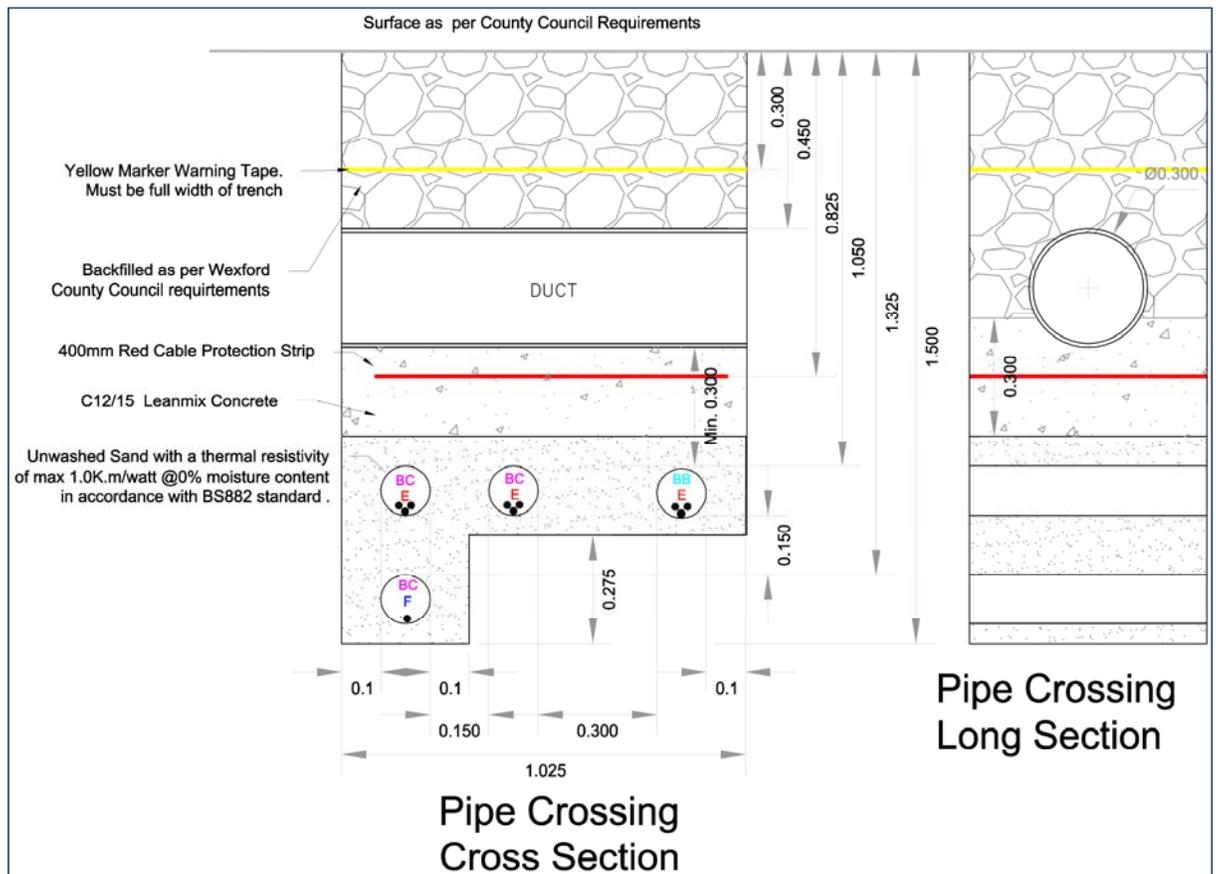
Typical Detail for Crossing under existing storm drainage pipes
